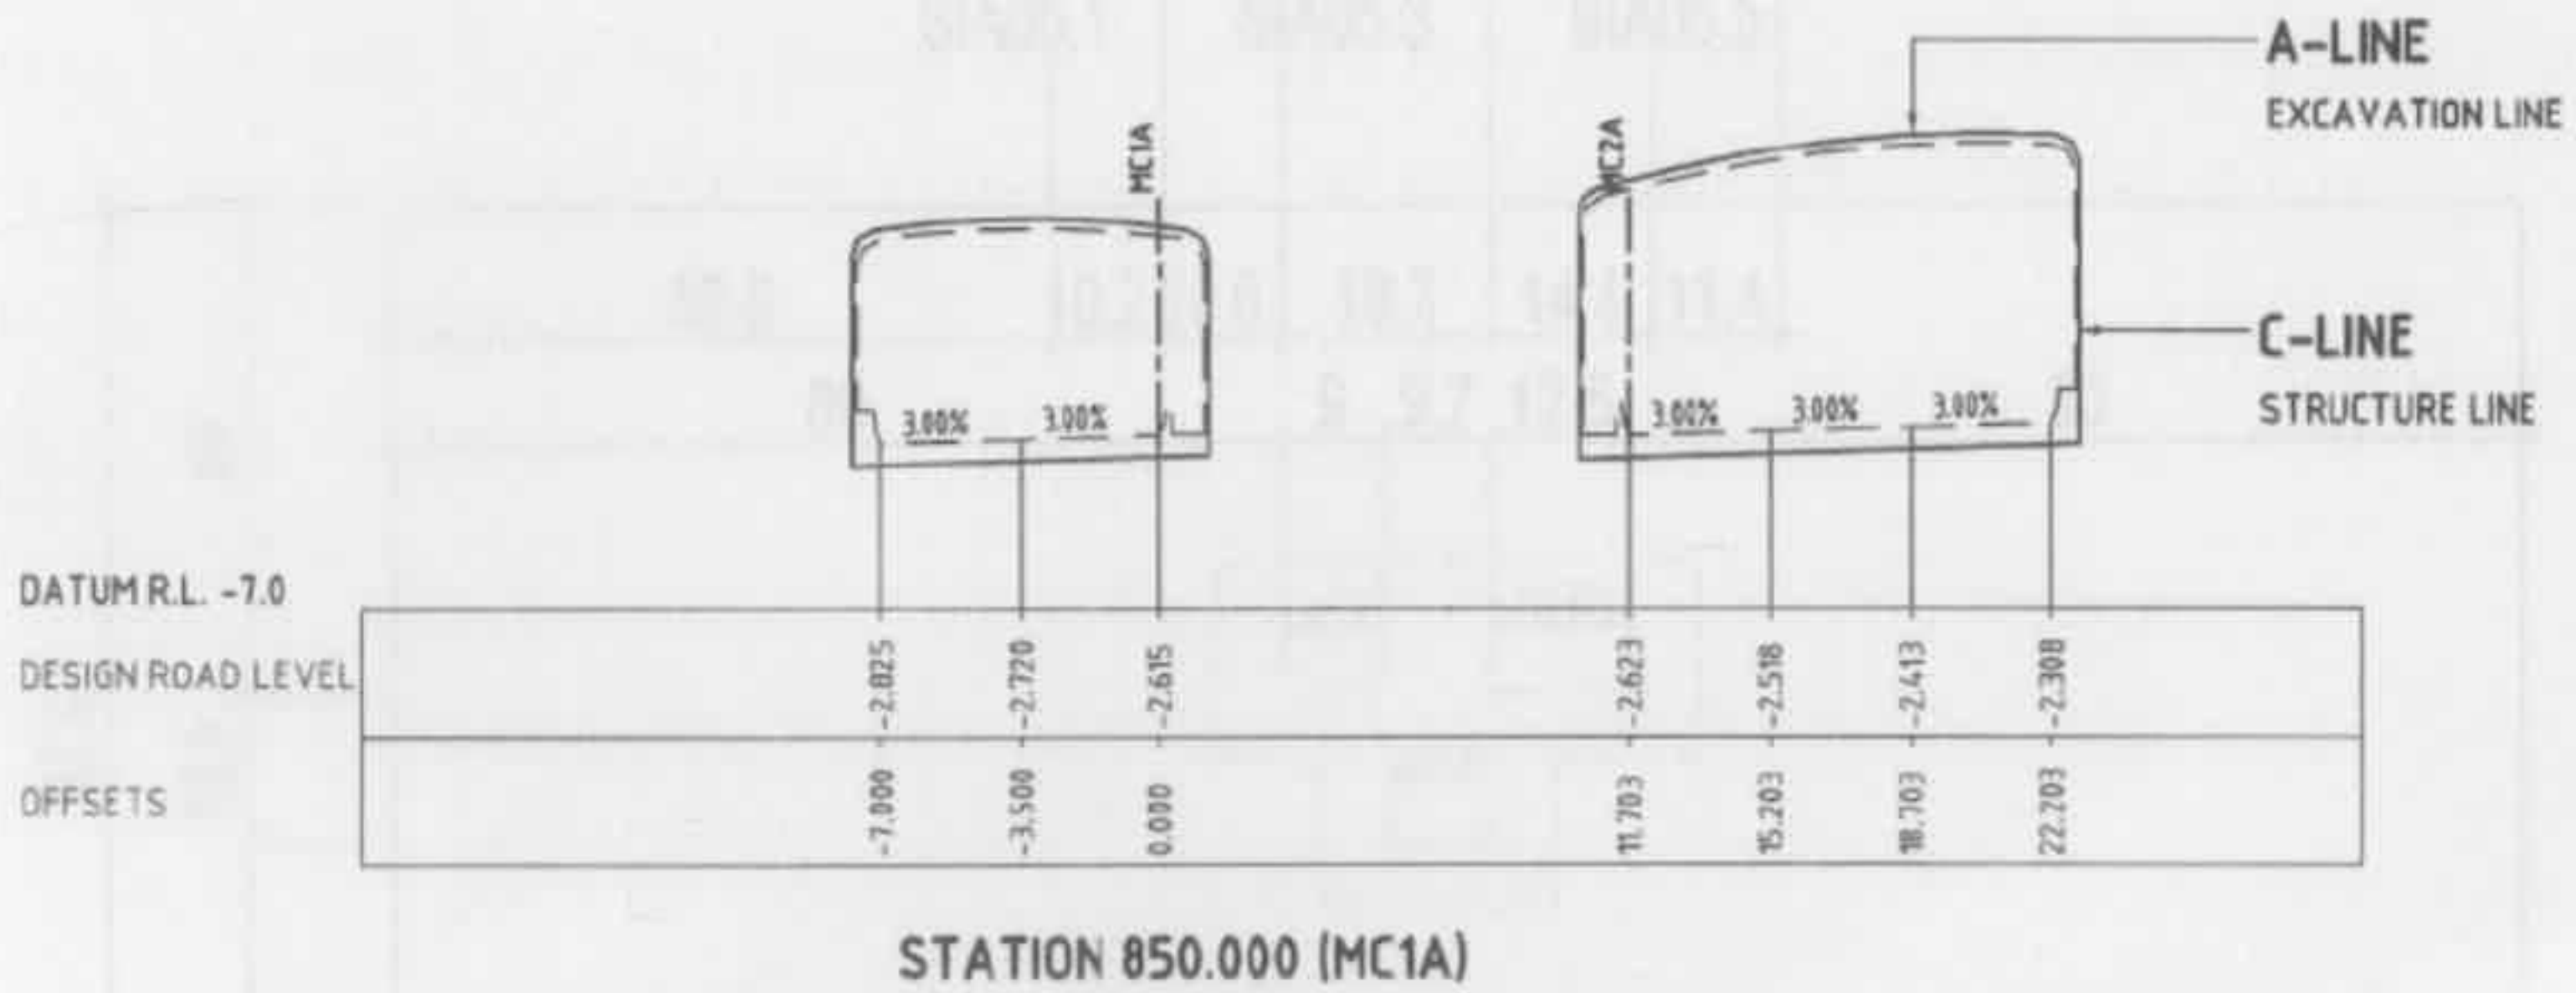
Eastbound and westbound road tunnel cross-sections.
